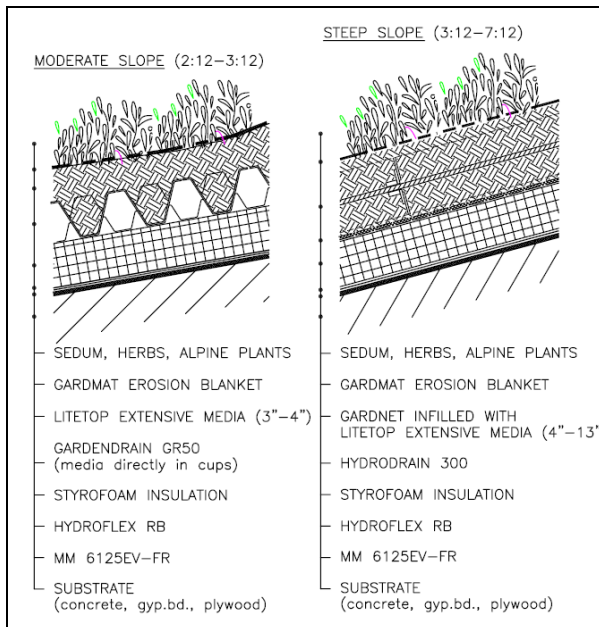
Hydrotech Typical Standard Sloped Green Roof Assemblies (<http://www.hydrotechusa.com>, accessed 7/4/08)
